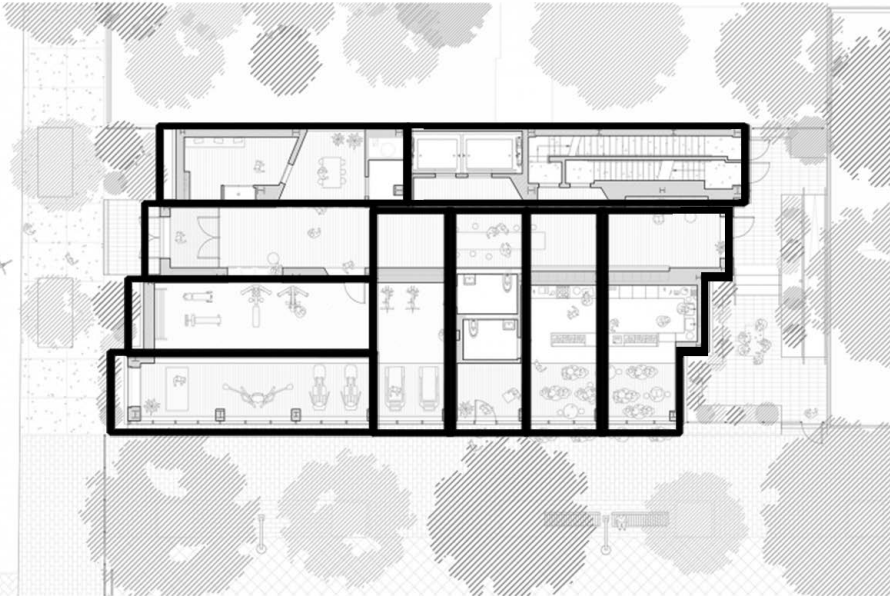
| CARMEL PLACE LEVEL 1 MODULAR LAYOUT | SOURCE IMAGE: [HTTPS://WWW.WORLD-ARCHITECTS.COM/EN/ARCHITECTURE-NEWS/REVIEWS/CARMEL-PLACE-1](https://www.world-architects.com/en/architecture-news/reviews/carmel-place-1)
